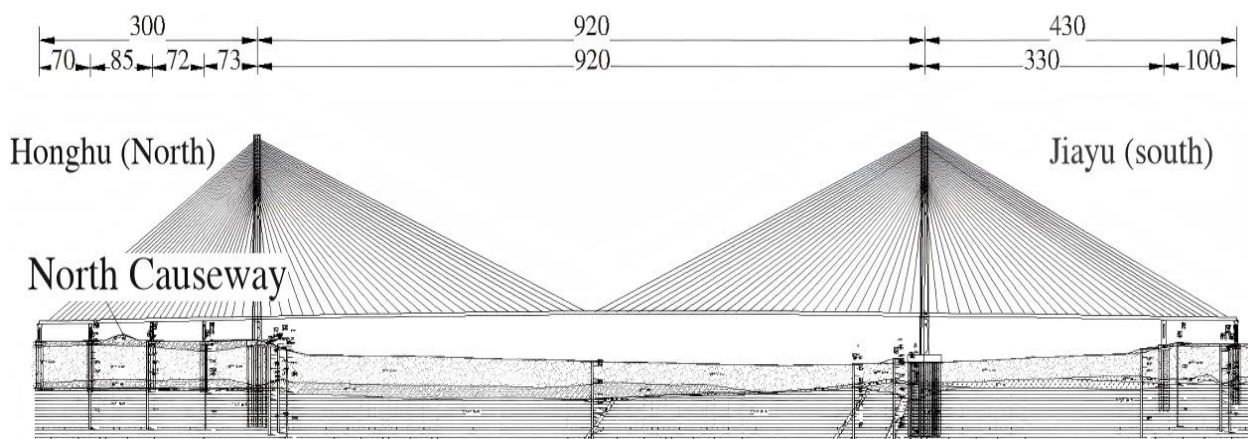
Main bridge facade layout of Jiayu Yangtze River Highway Bridge (unit: m)
